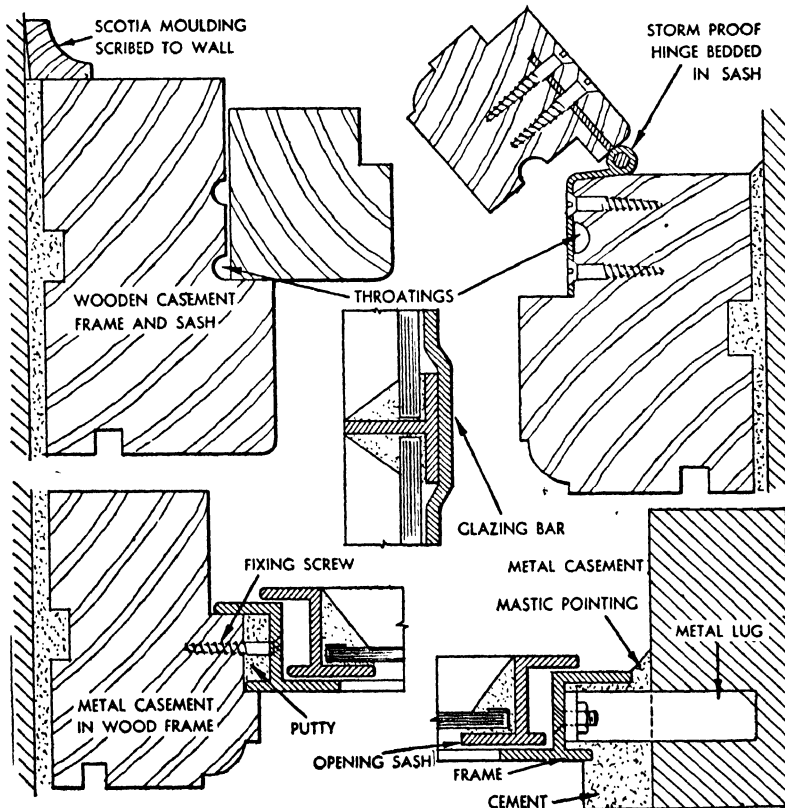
Half full-size sections of jamb to casement windows. In repair work the joint between the frame and the walls must be carefully sealed either by pointing with mastic or by scribing a moulding to the wall.
